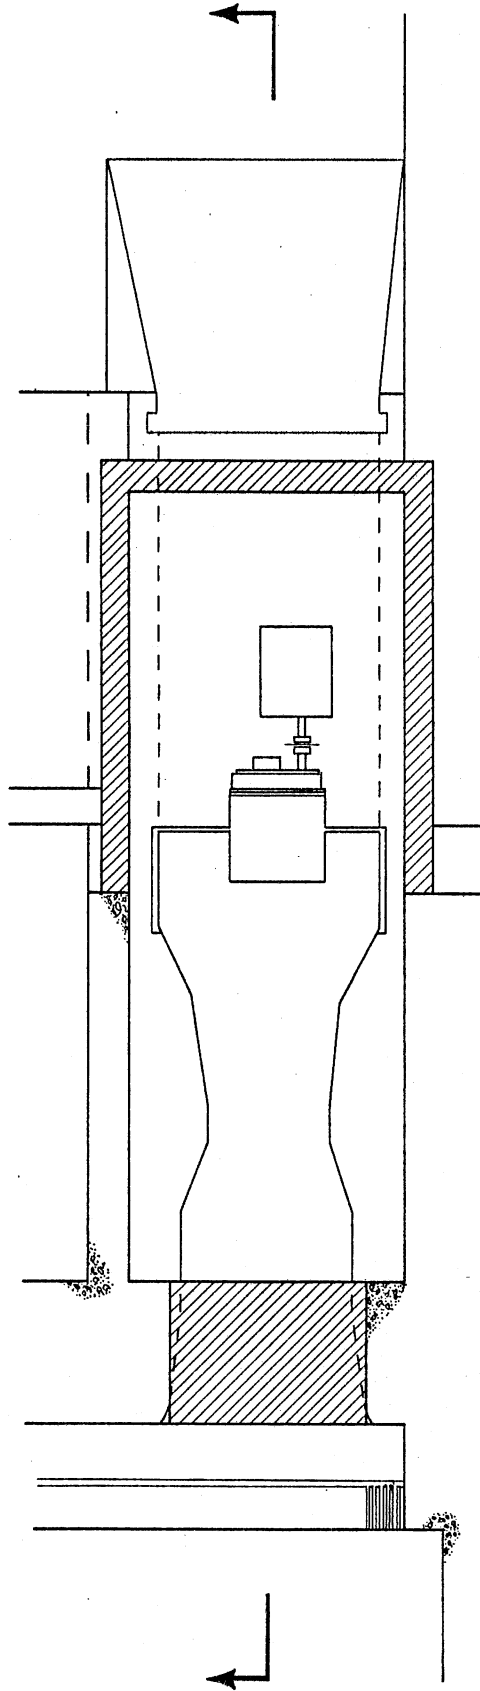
Plan View of Alternative D: Only one Turbine Bay is Used.
